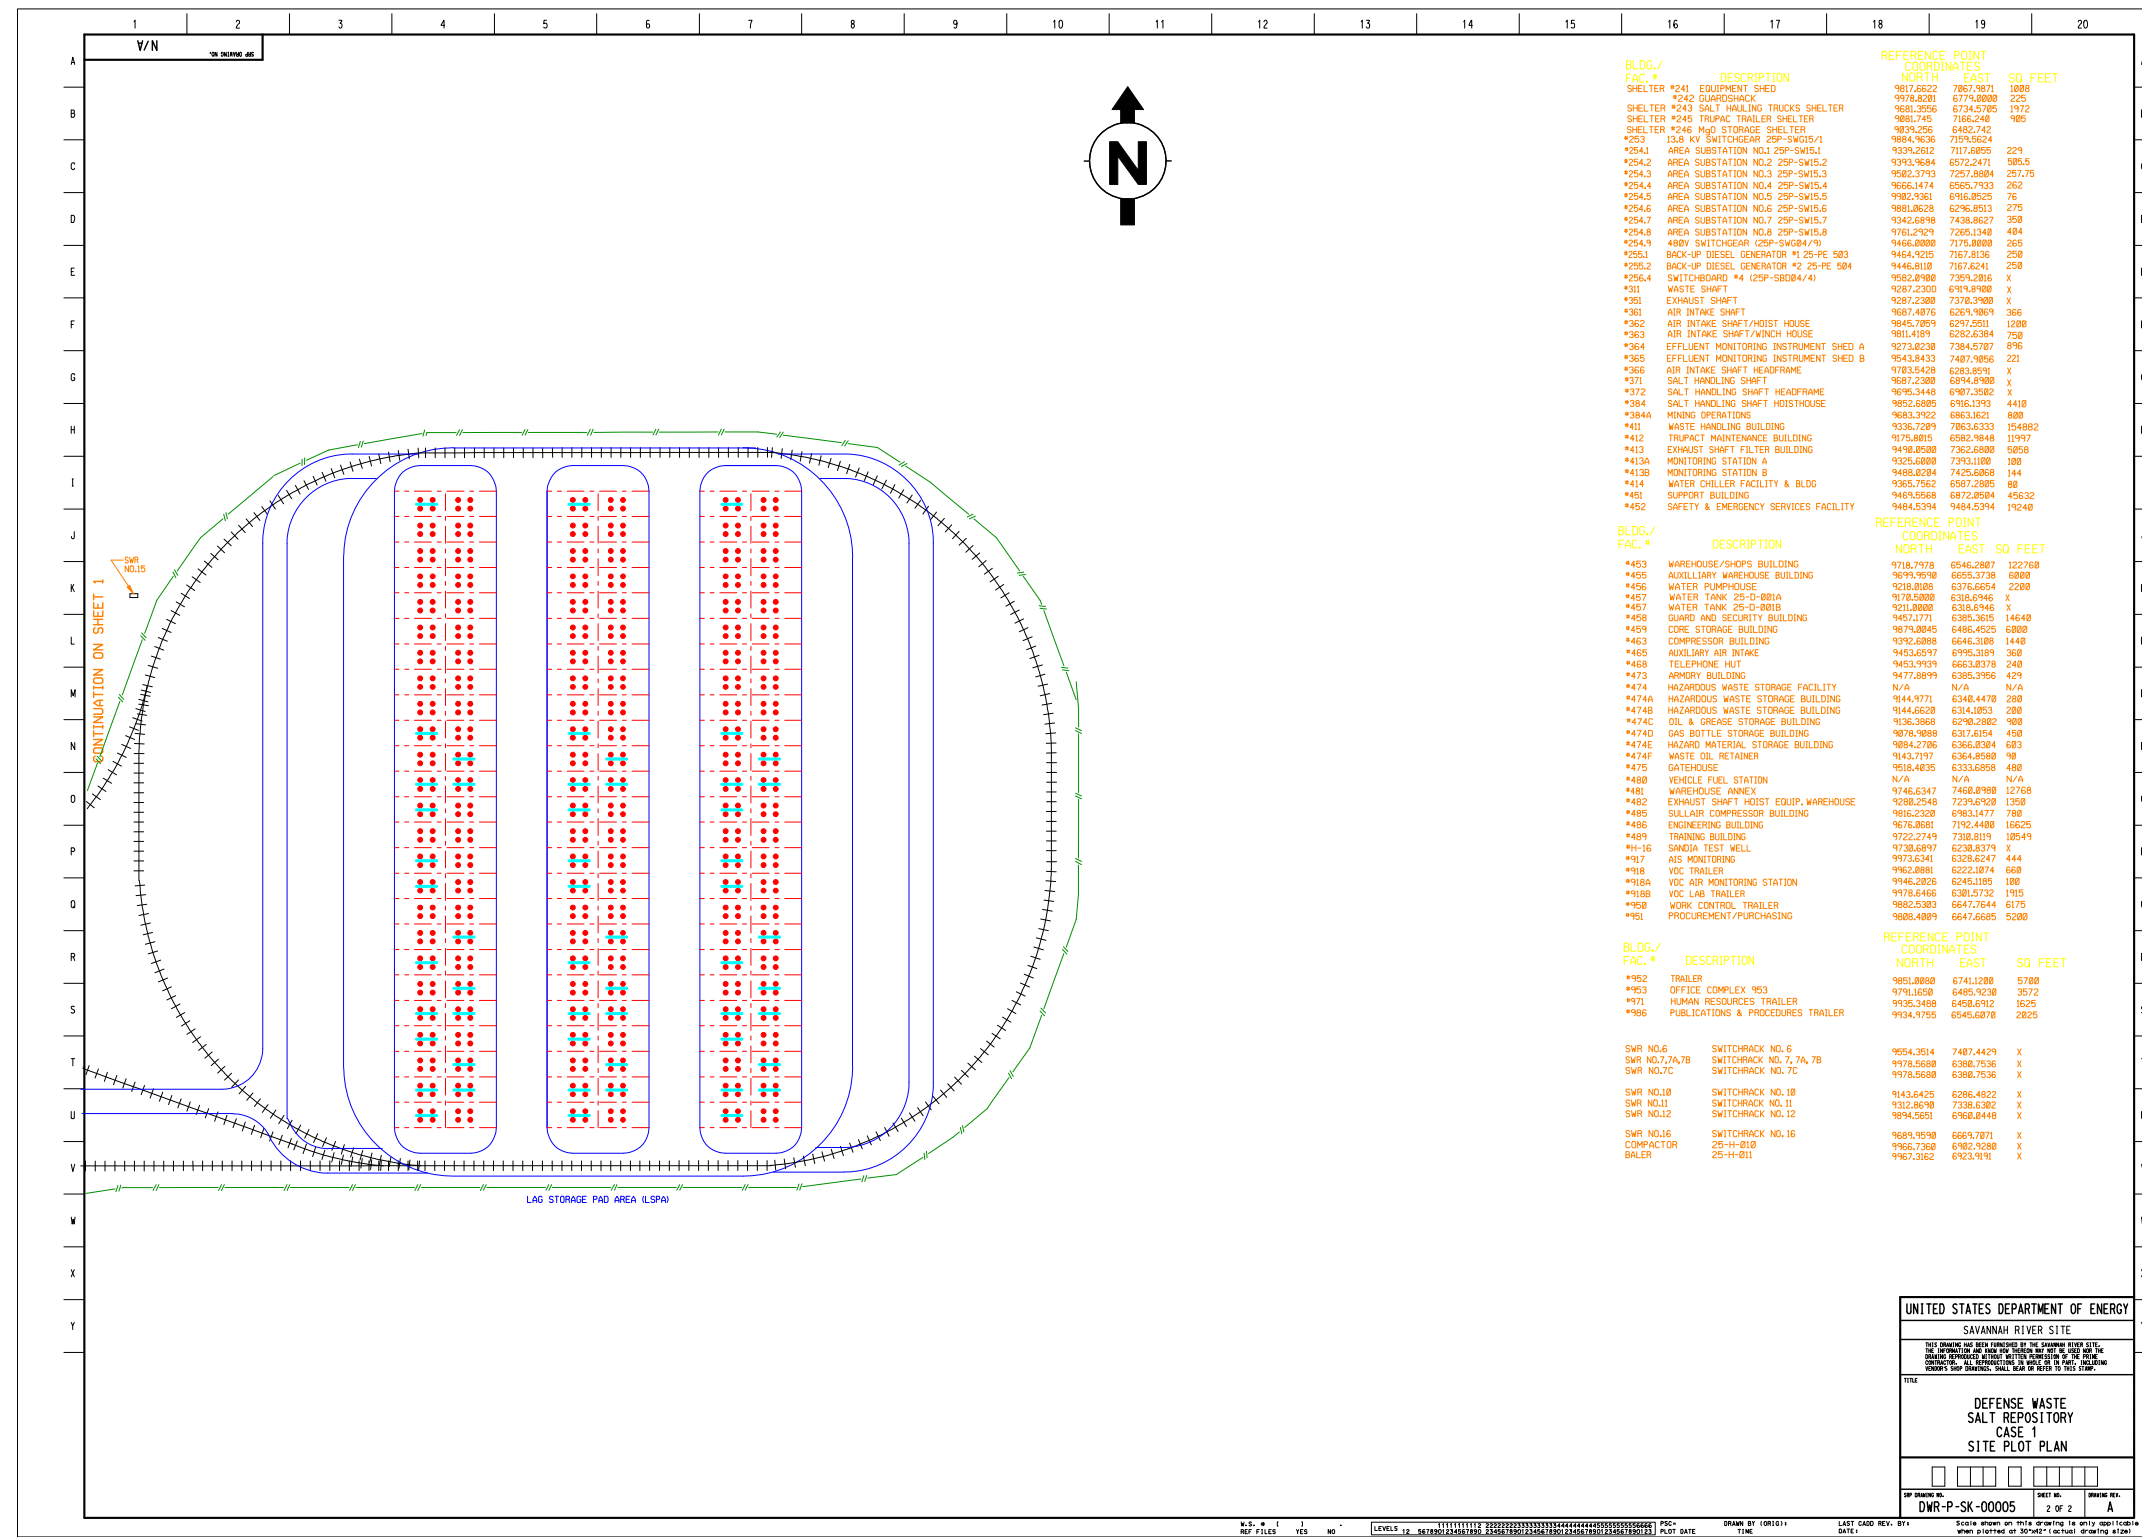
B Case 1 WIPP Surface Facilities, Sheet 2 – Lag Storage Area and Structures List
